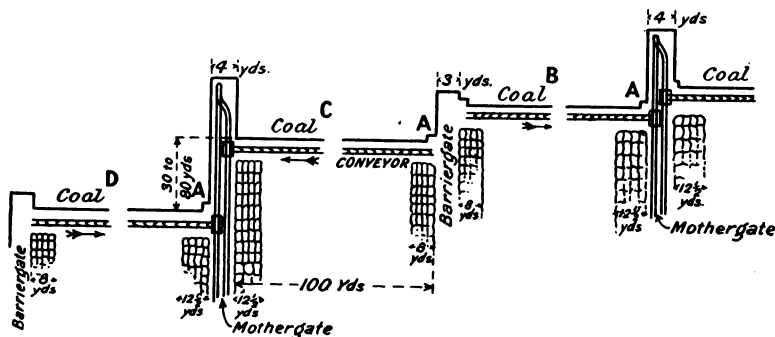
An Arrangement of Long-wall Faces for Mechanical Coal-cutting and Conveying of Coal.
